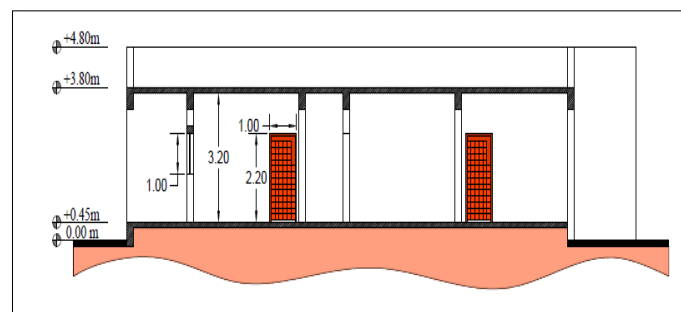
Section of Abdalmast Shahrani house in Tripoli.
